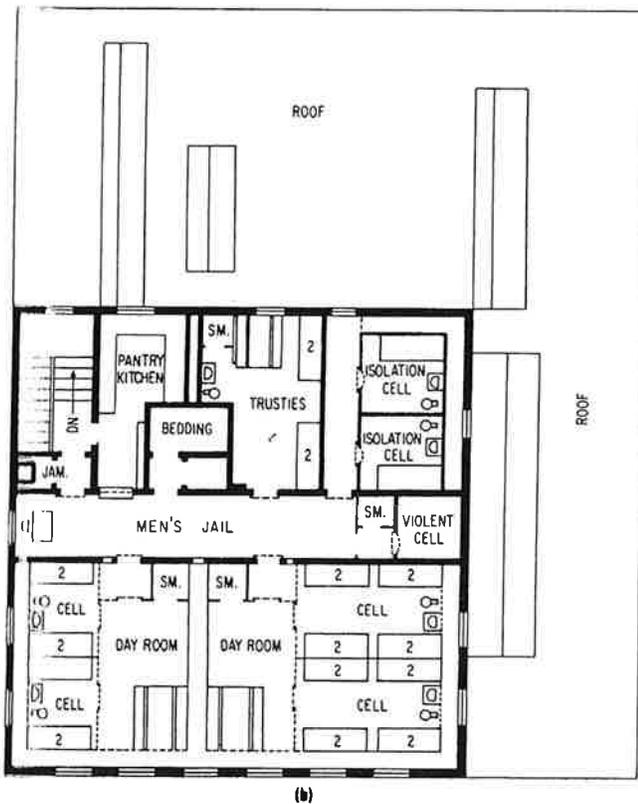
(cont.) Plan of police station for city of 15,000 population. Building 6,000 square feet. (b) Second floor plan
